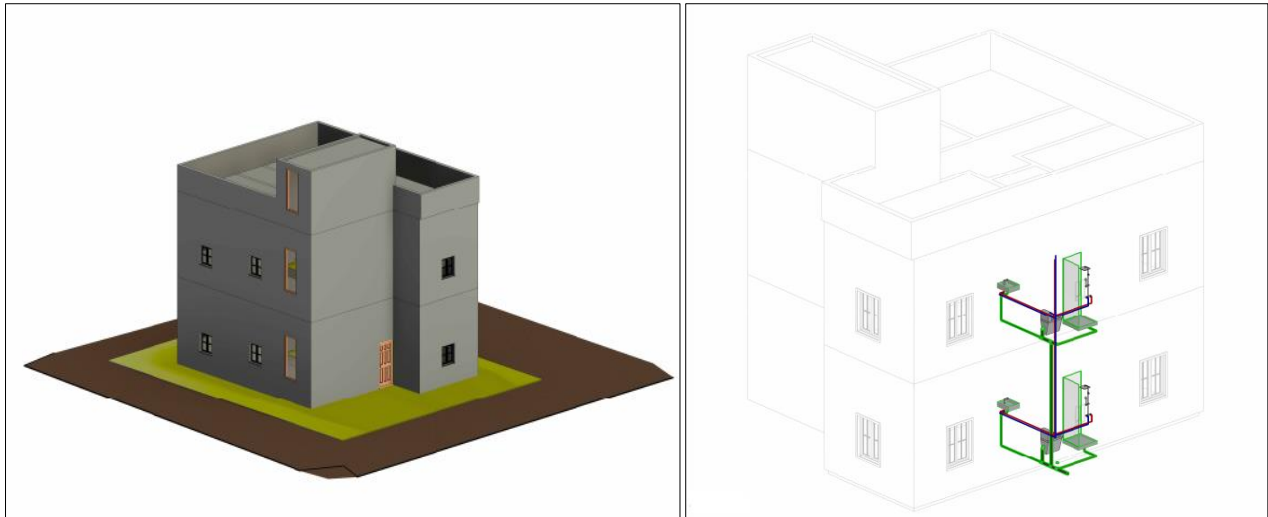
3D models of the case study building: (a) Architectural design overview; (b) MEP infrastructure and plumbing layout
